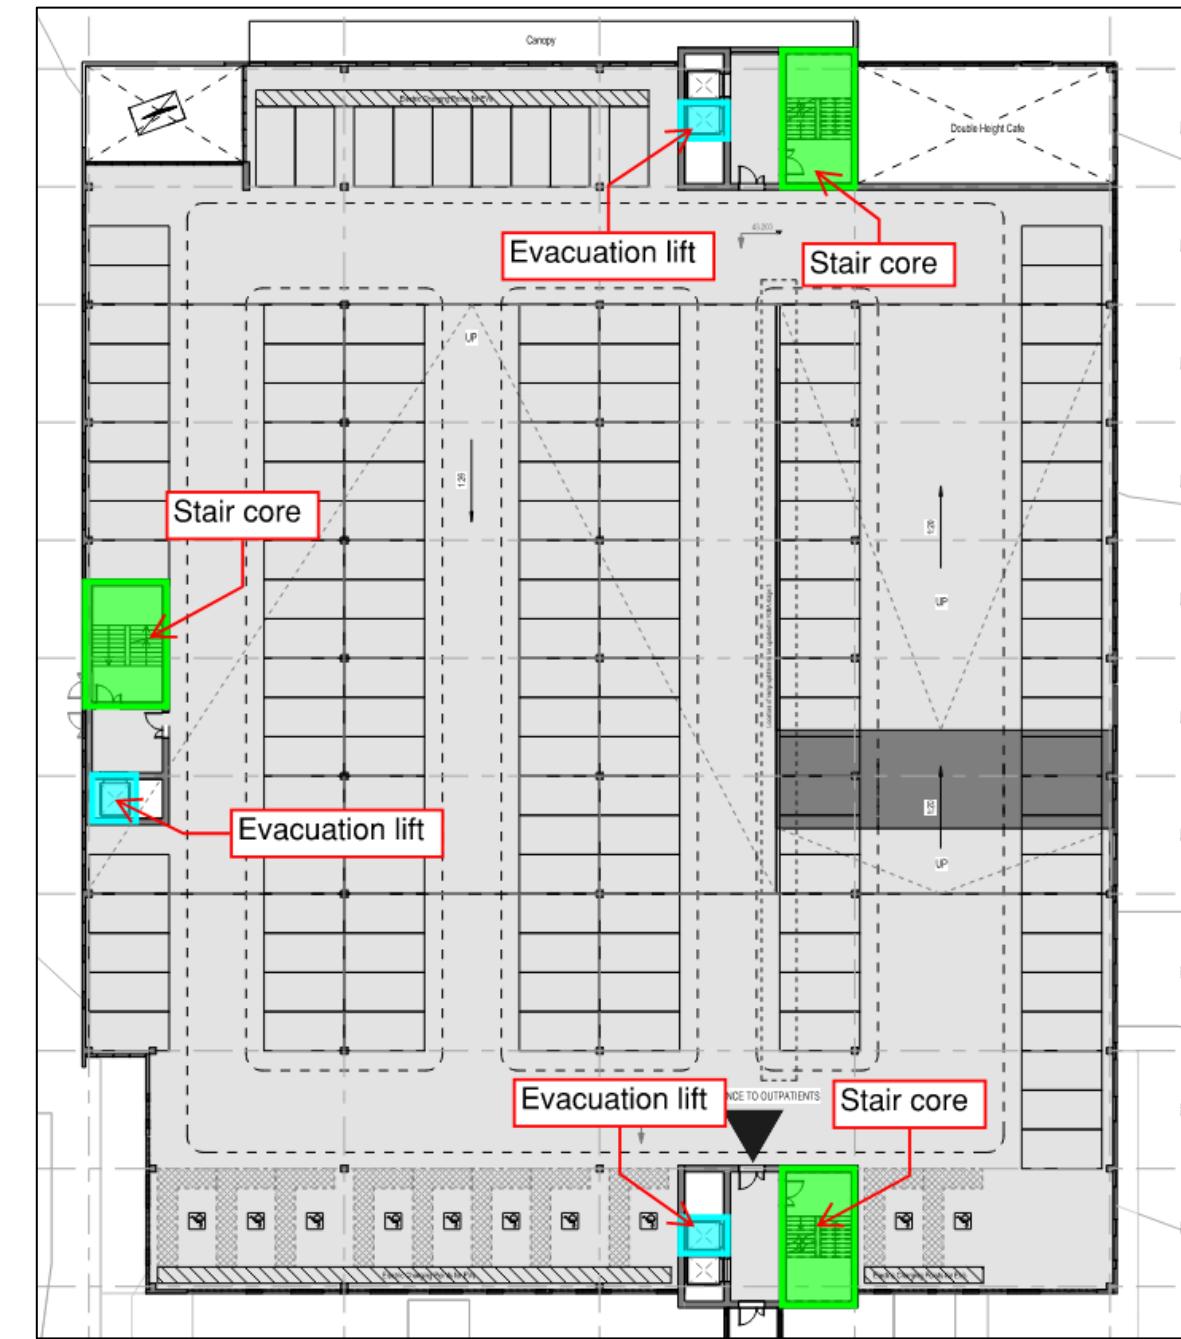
Schematic first floor plan showing stair cores and fire evacuation lifts
